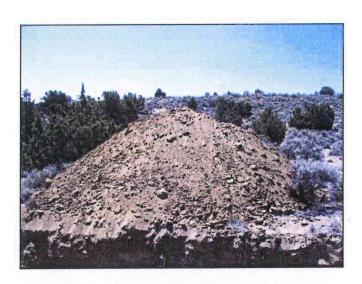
Site and soil conditions associated with Test Pit 3 (TP-3).
